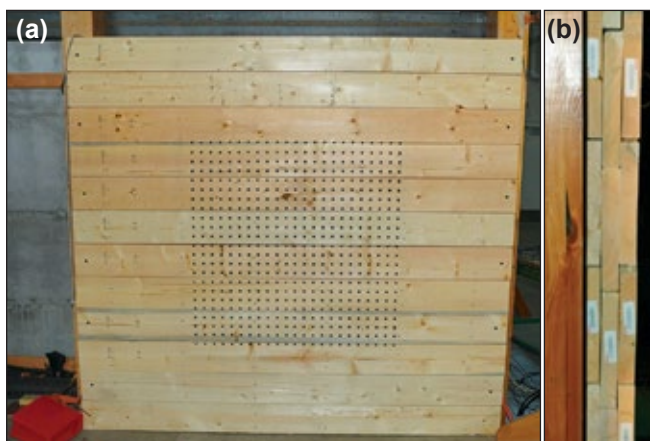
Nail laminated 2 × 8 wall design. (a) 2 × 8 wall prior to attachment of wood sheathing. (b) Side view of wall before application of sheathing.
